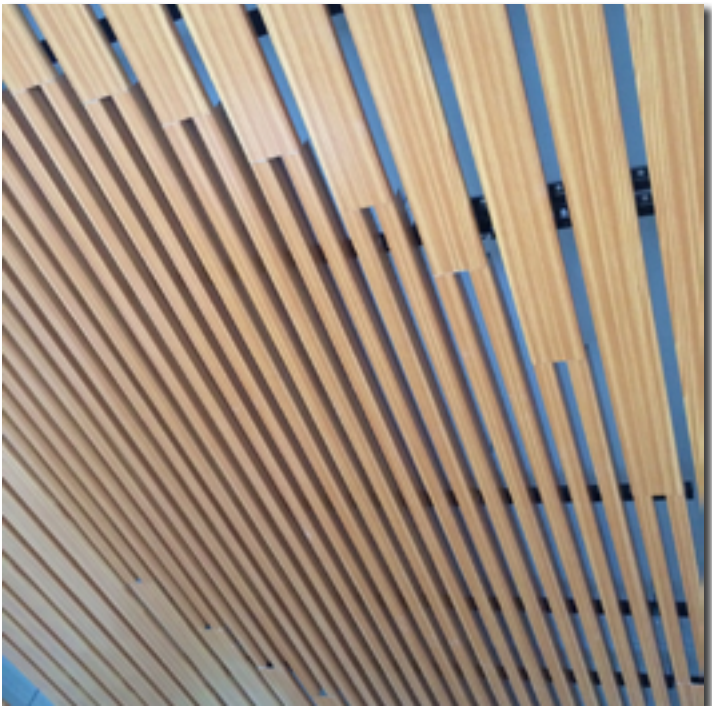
Ceiling mock-up. The final ceiling will be 18cm wide wood planks with black 2cm seams.
